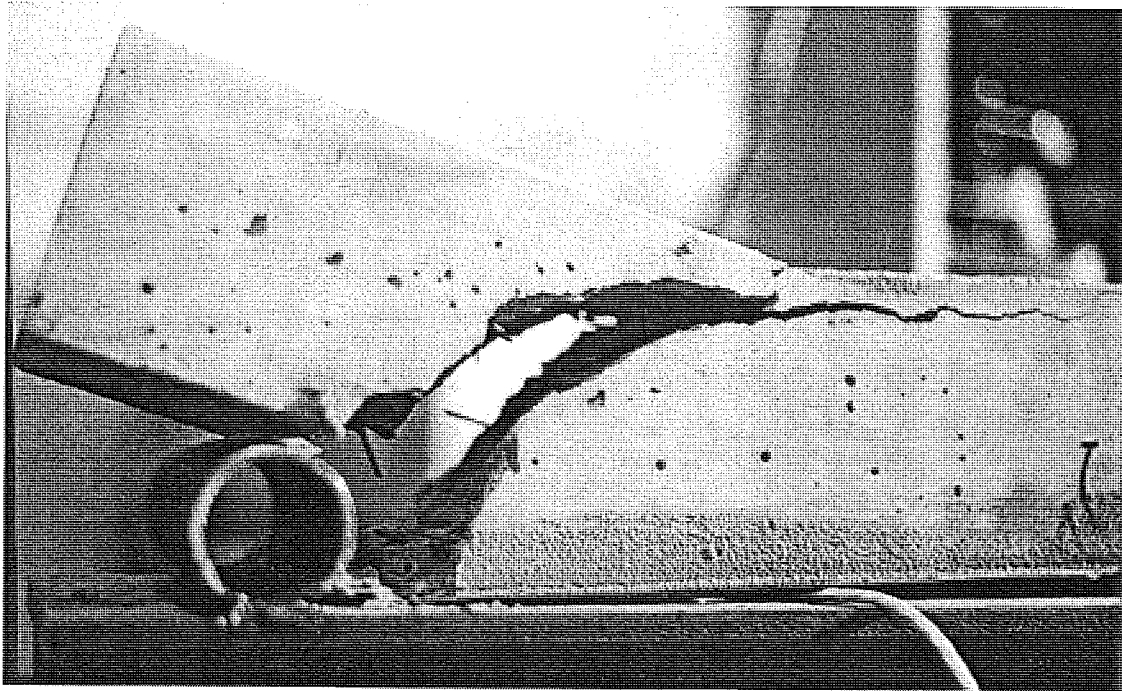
Vertical Failure of a Specimen Strengthened with Sika System
